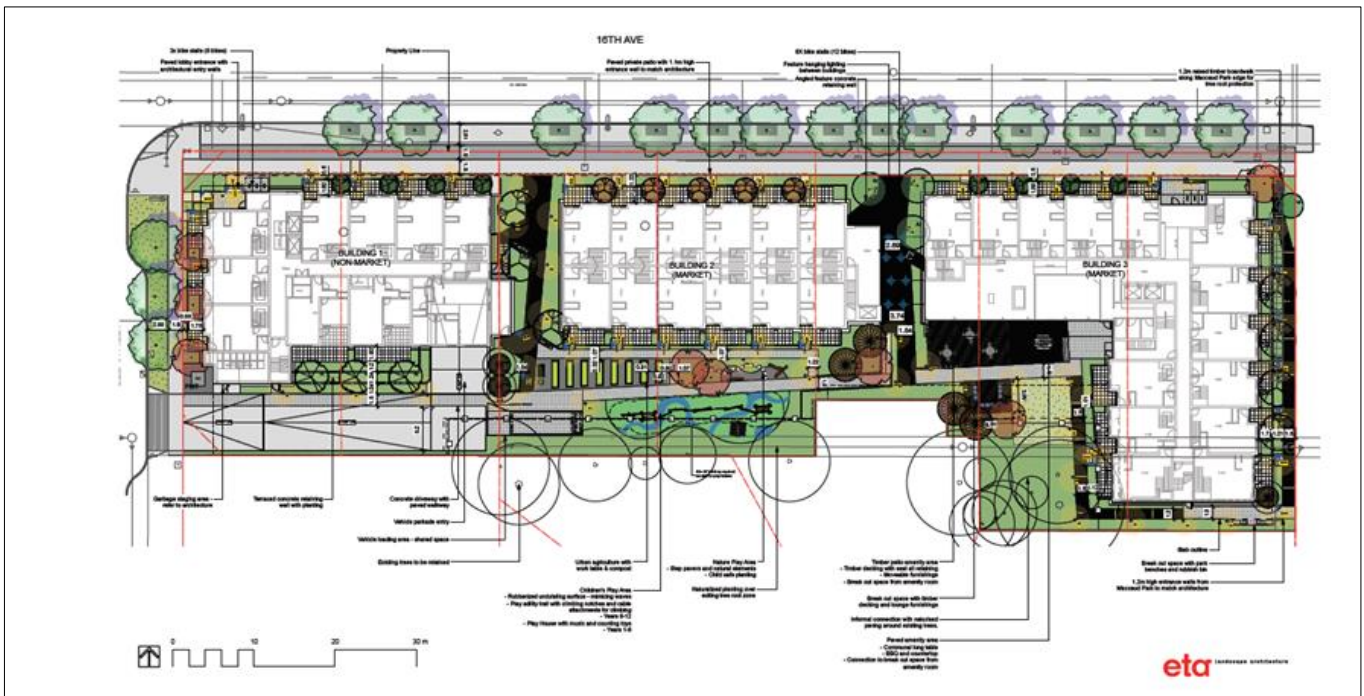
Site Plan of the Current Submission (Apr 14, 2022)
